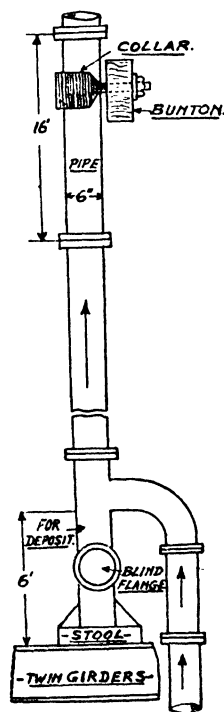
Stool and Clamps for Rising Main of a Pump.
